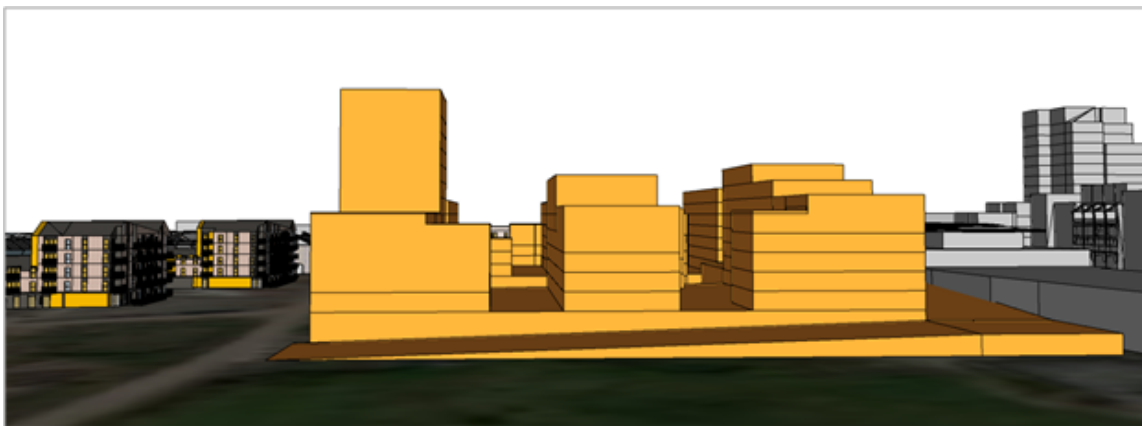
Project Shoreline GA1 - Elevation Layout Block D
